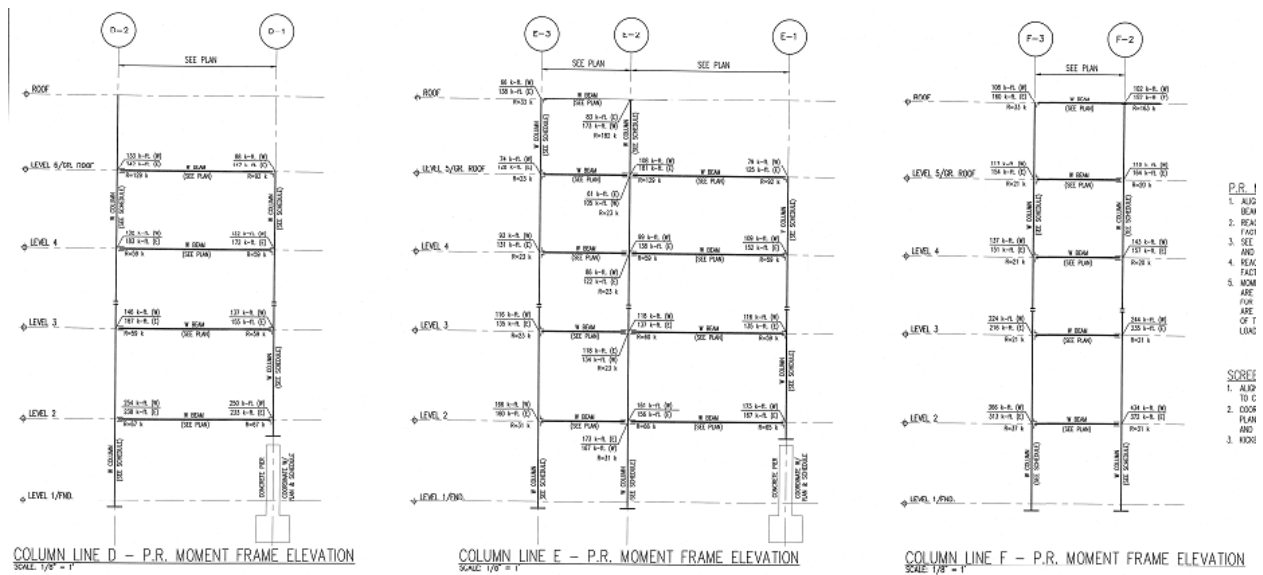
P.R. Moment Frame Elevations (D, E, and F)
